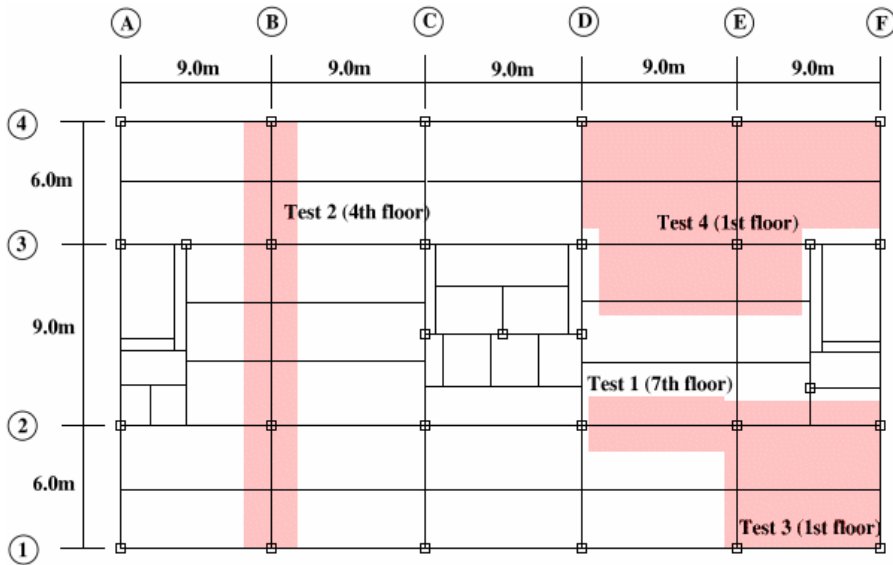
Floor plan showing where tests conducted by British Steel took place (Newman, 2000)
